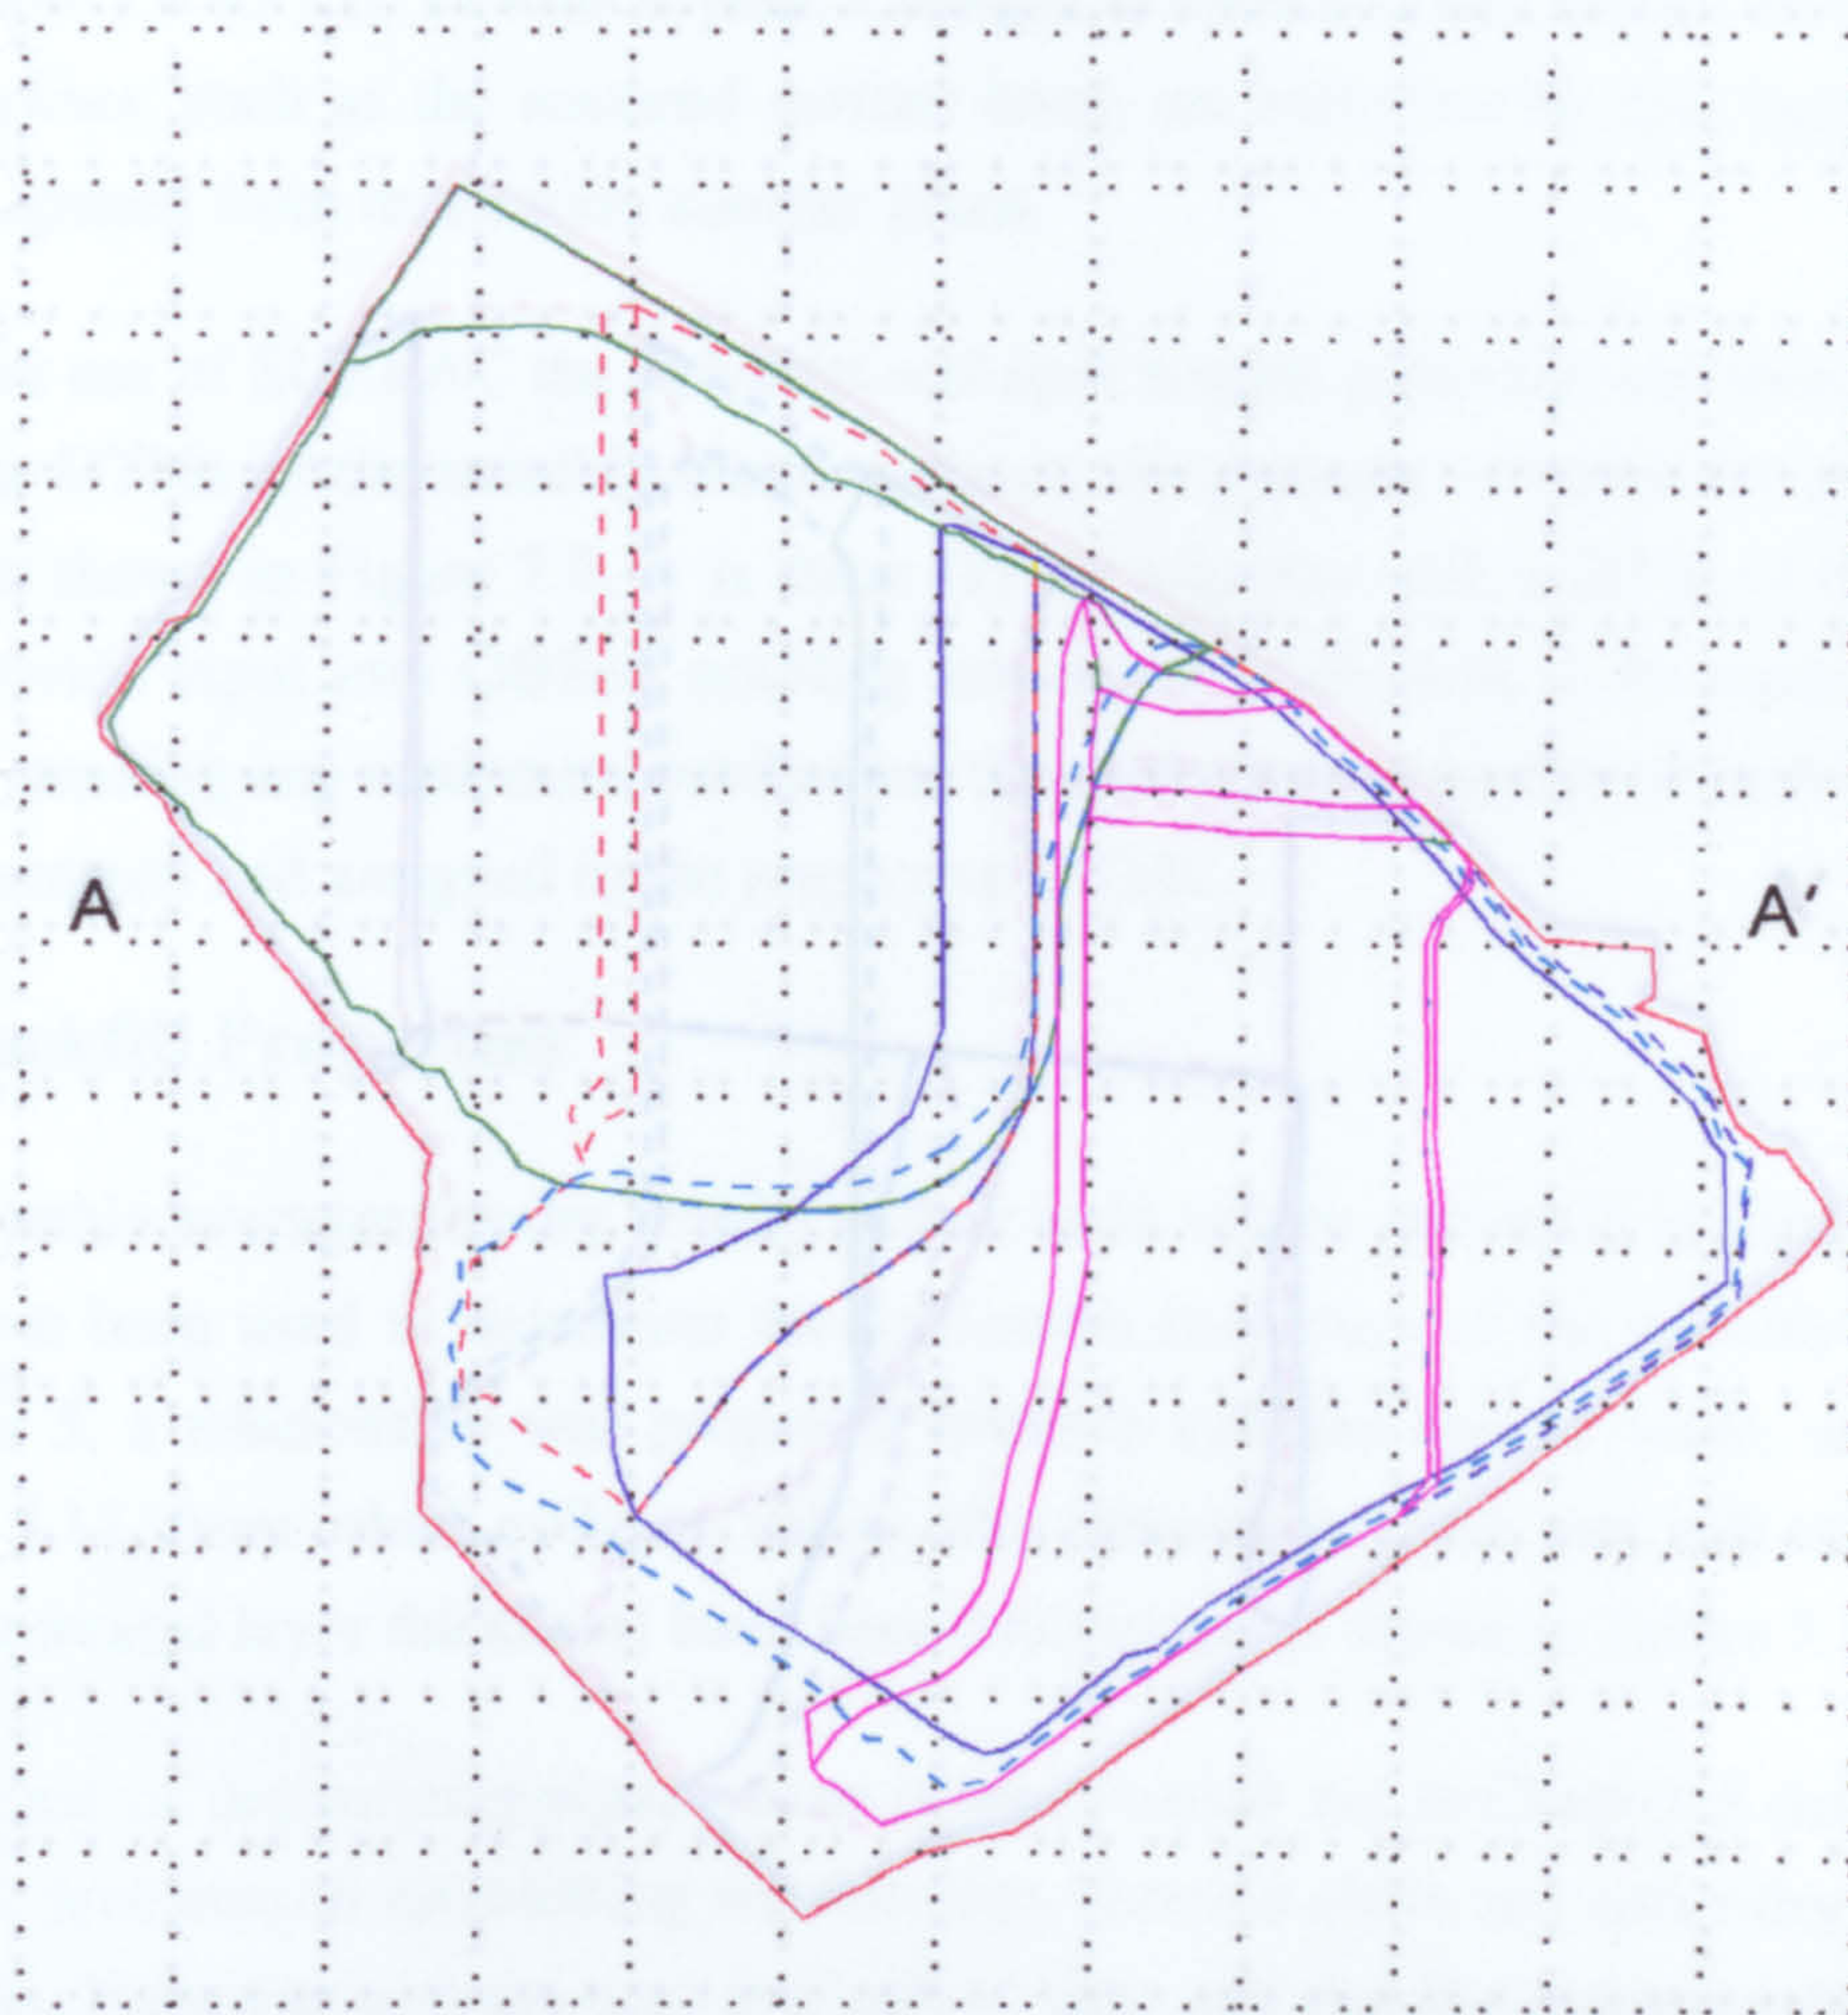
Site A, cross section A-A', showing the position of the backfilling blocks SP1 to MR3.
